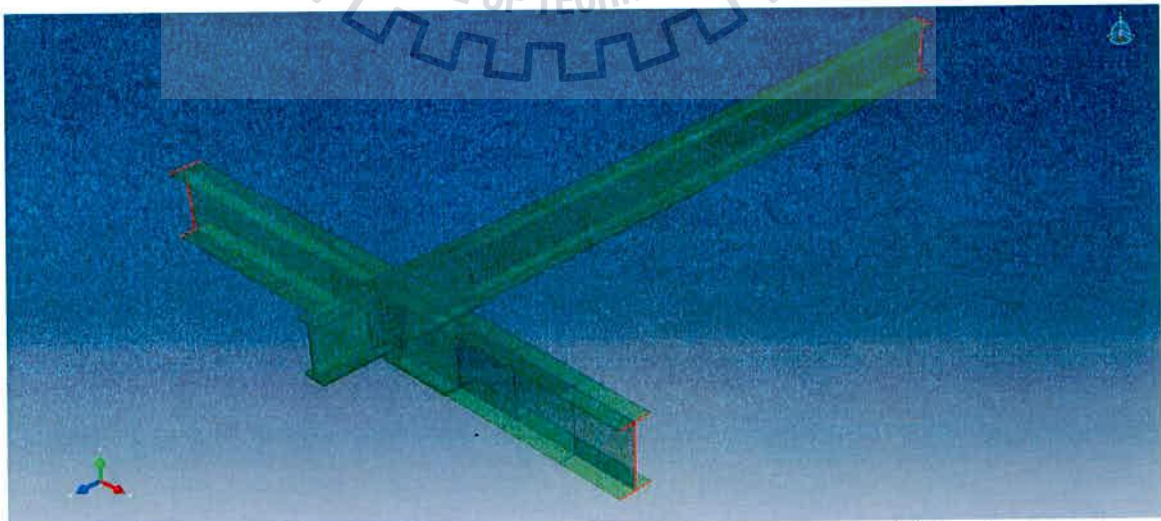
Boundary conditions for assembly of the connection model for checking the joint rigidity
